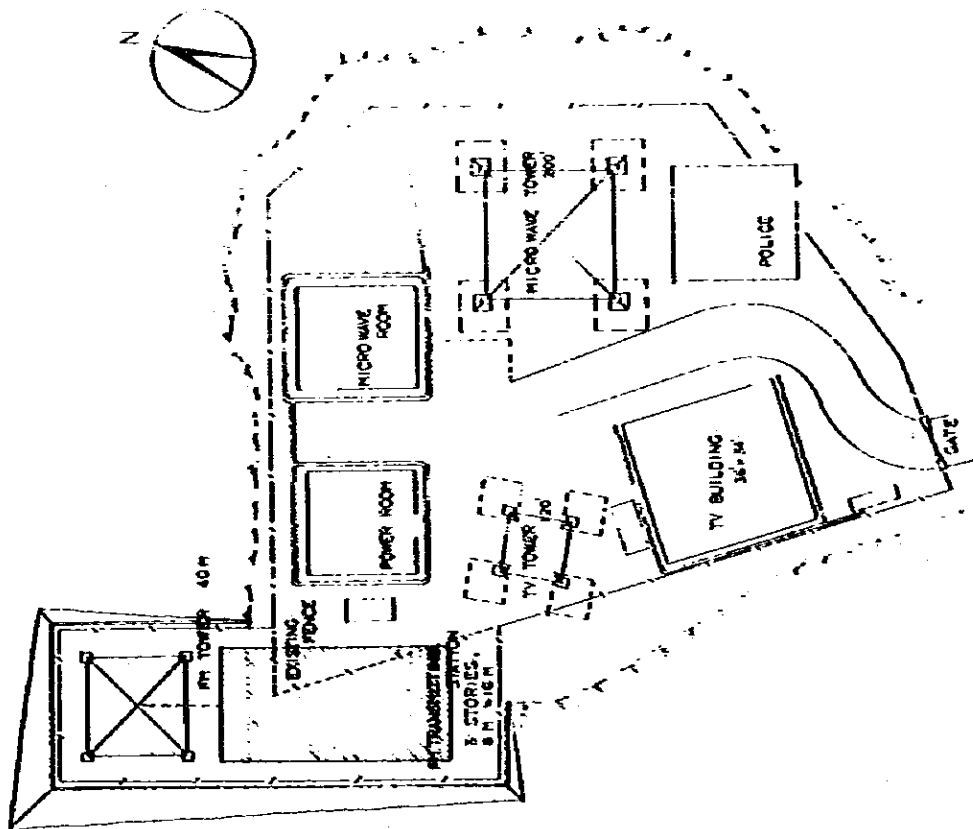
Site Plan -- Bt. Bank, Dungun
